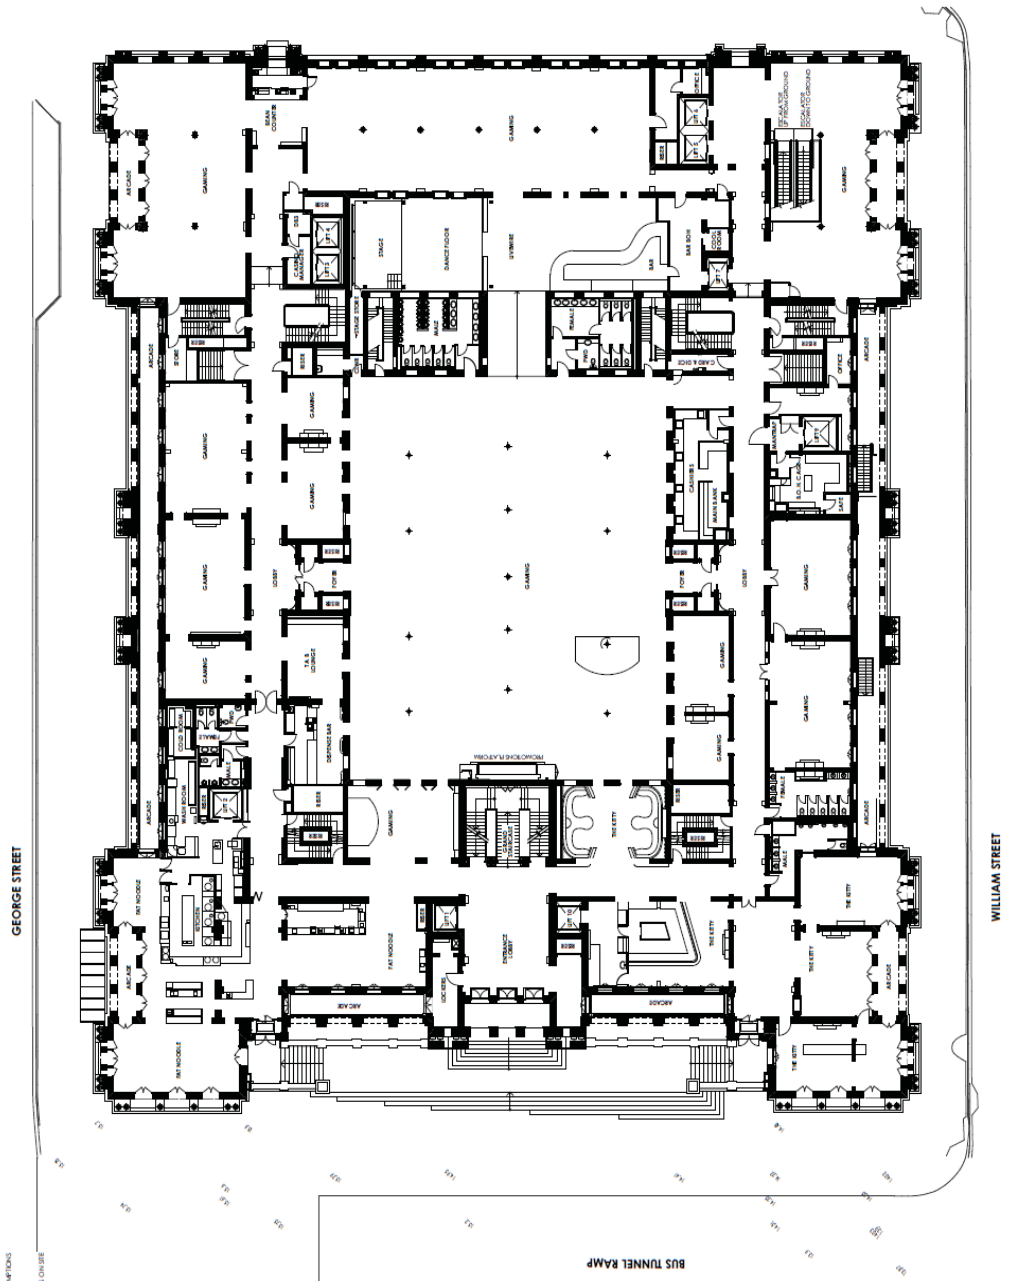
Floor Plan Queen Street Level (ML Design 2016)
